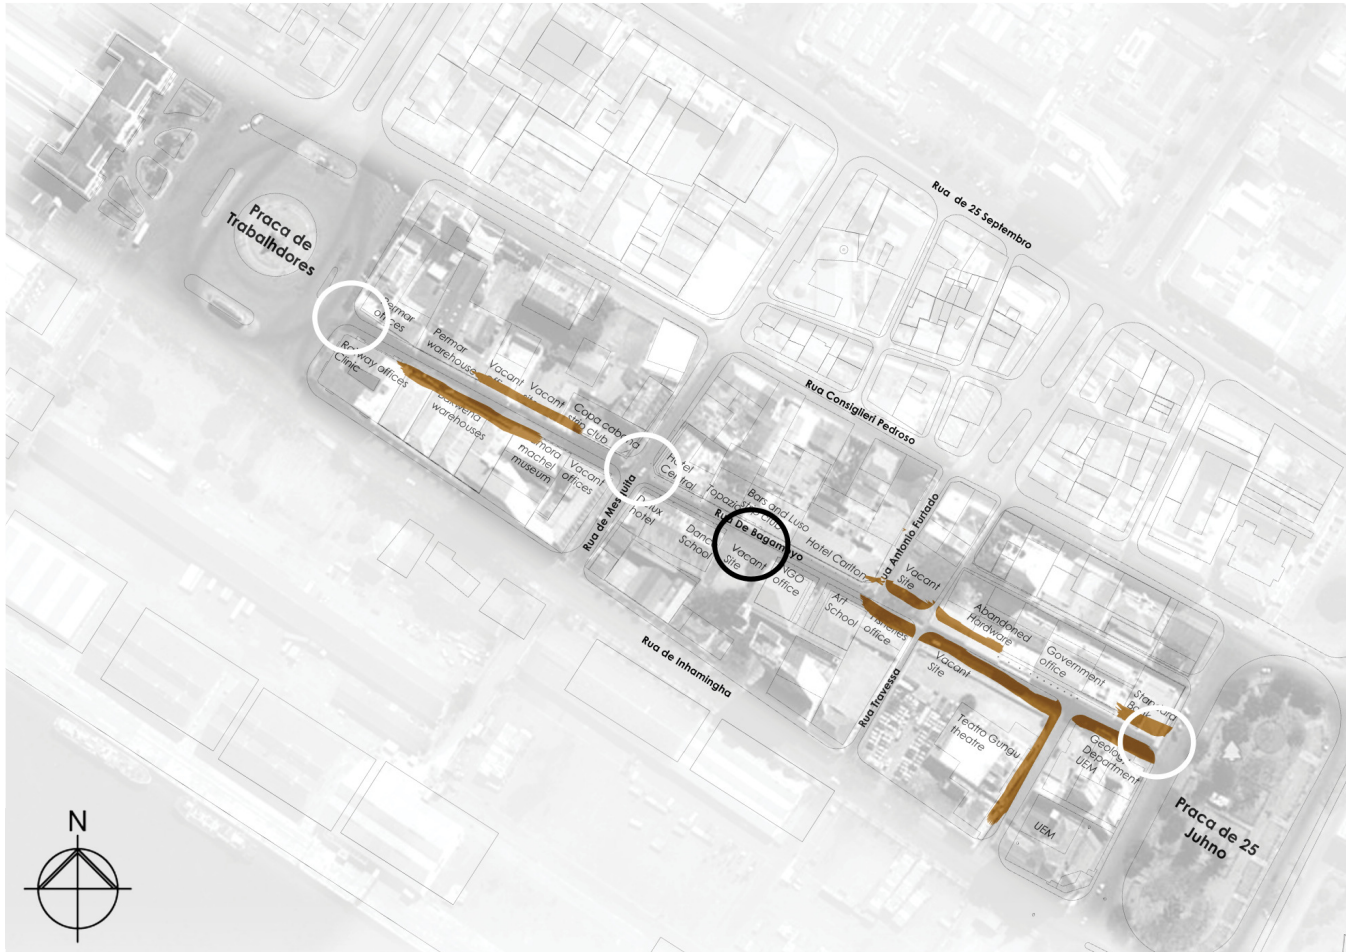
Plan showing positions of shading structures and new light and entrances
